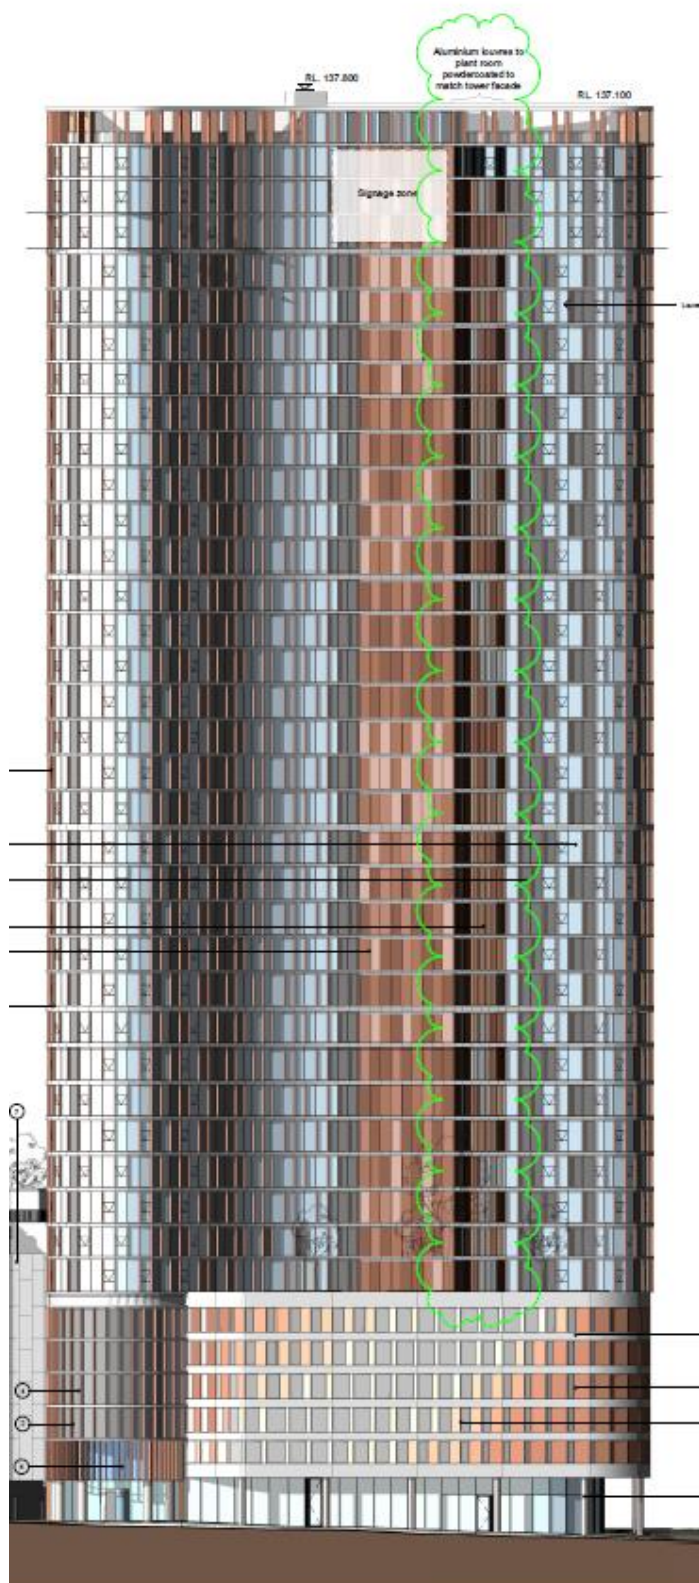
Proposed fixed open aluminium louvres to the plant room on Levels 7 to 37 on the south west elevation
